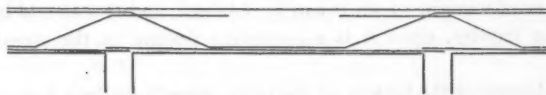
MAIN BARS ARRANGED TO RESIST SHEAR.
